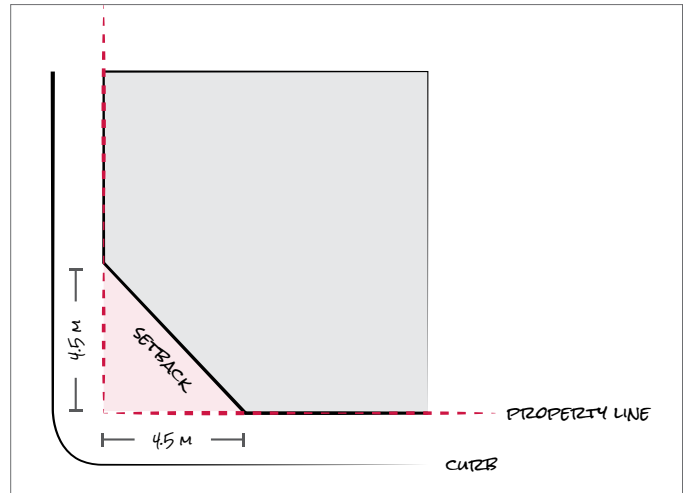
Provide a triangular setback on corner sites with retail frontage (5.1.3 b).
